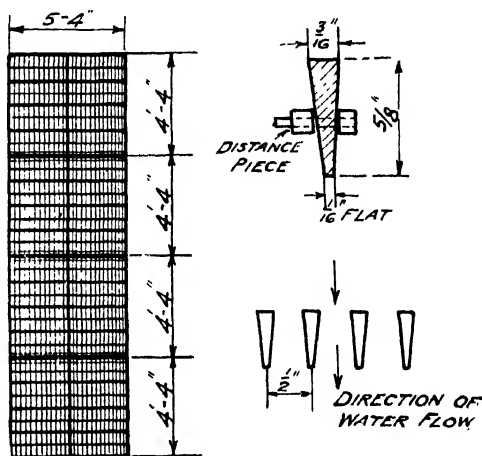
Ash Sump Screen Details. (Mild Steel or Cast Iron.)
